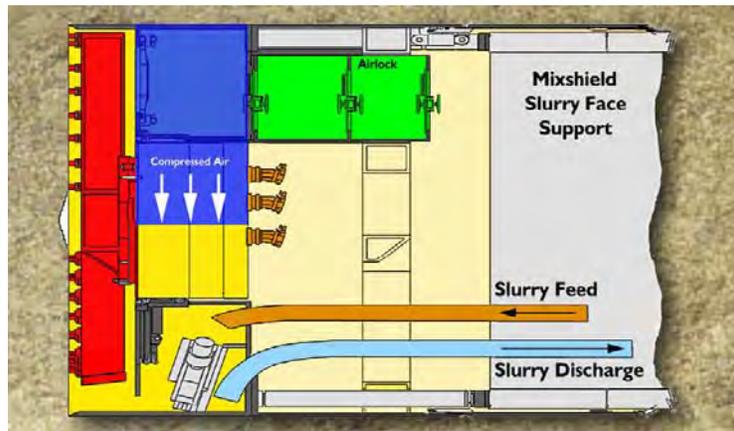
Simplified Cross-section of Slurry Face Tunnel Boring Machine (SFM) (from Herrenknecht).
